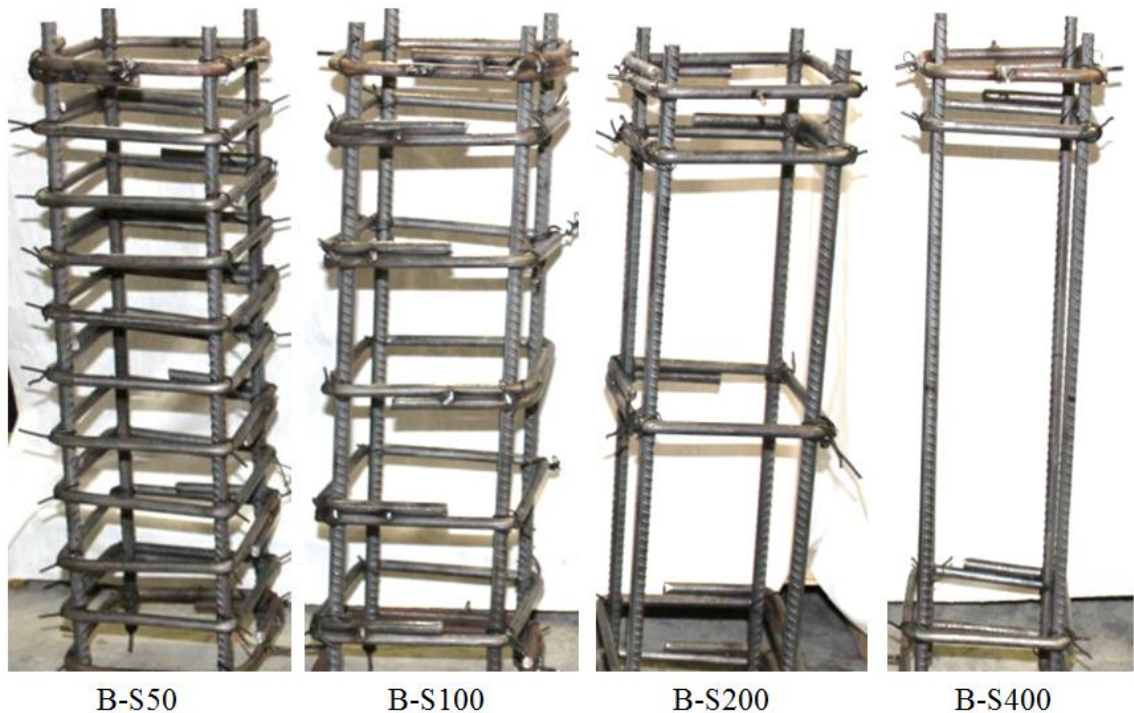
Overview of the assembled steel cages of Group B specimens
